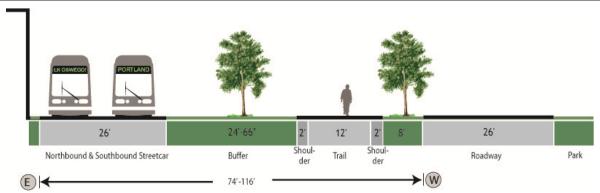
Section 1.5a1 Willamette Shore Line with Double-track Streetcar
